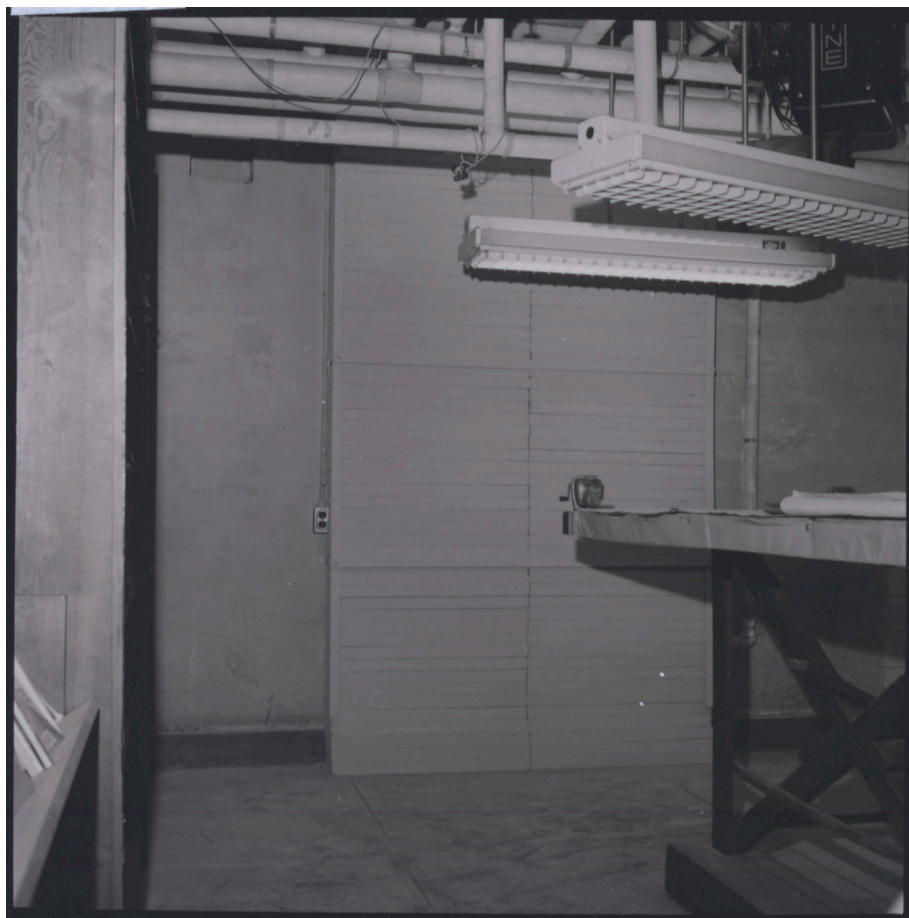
Window with concrete planks in place as part of modifications in the basement, 1962 (source: GRSM Archives, 06639)
